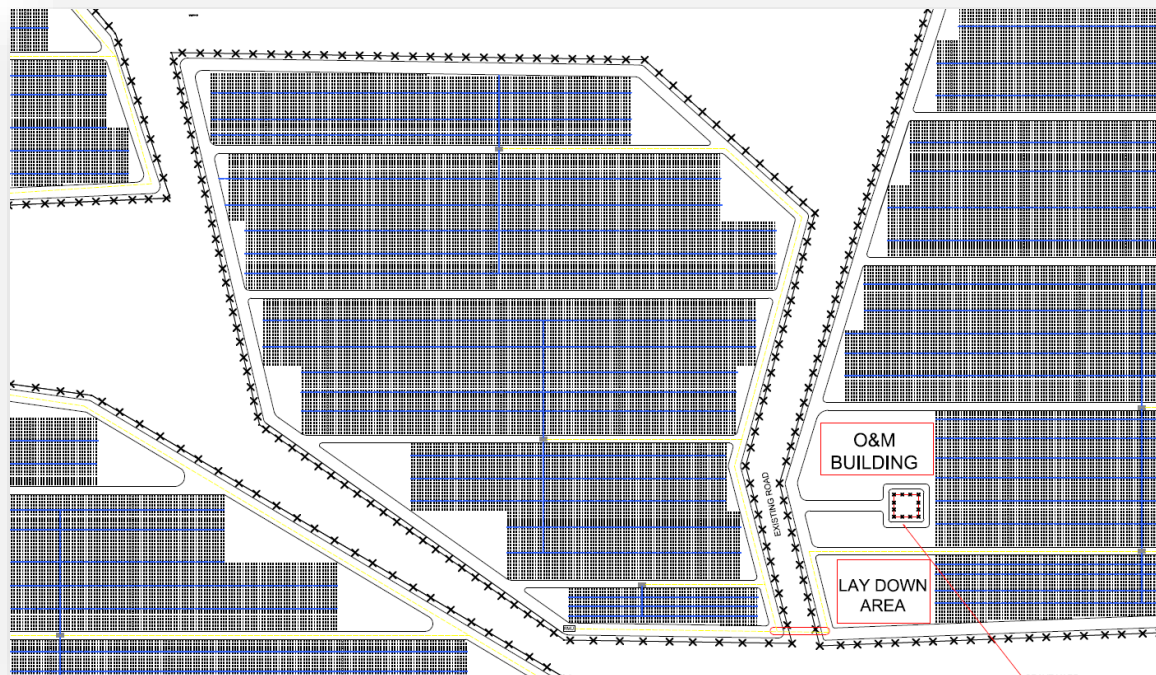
Zoomed Section of PV Plant showing the North-South orientation of the PV solar panels
